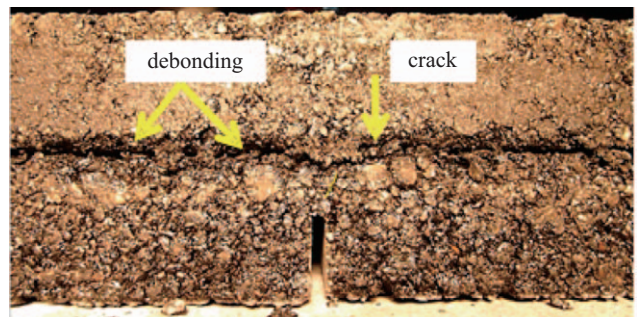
Failure caused by vertical crack propagation and debonding (slab 2 with Grid #1).
